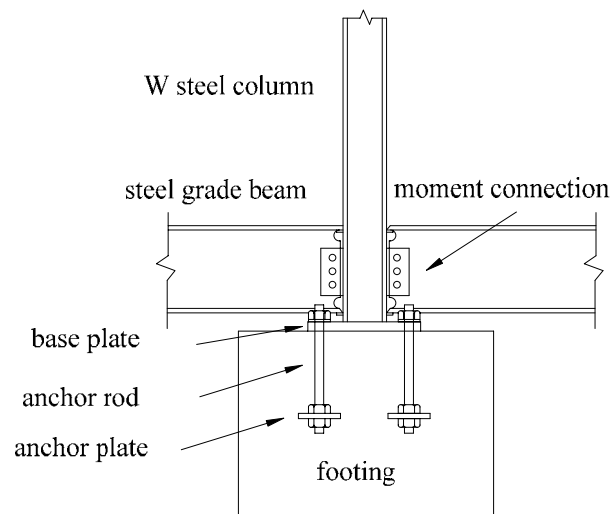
Unbraced frame column base connection with steel grade beam and exposed base plate.
